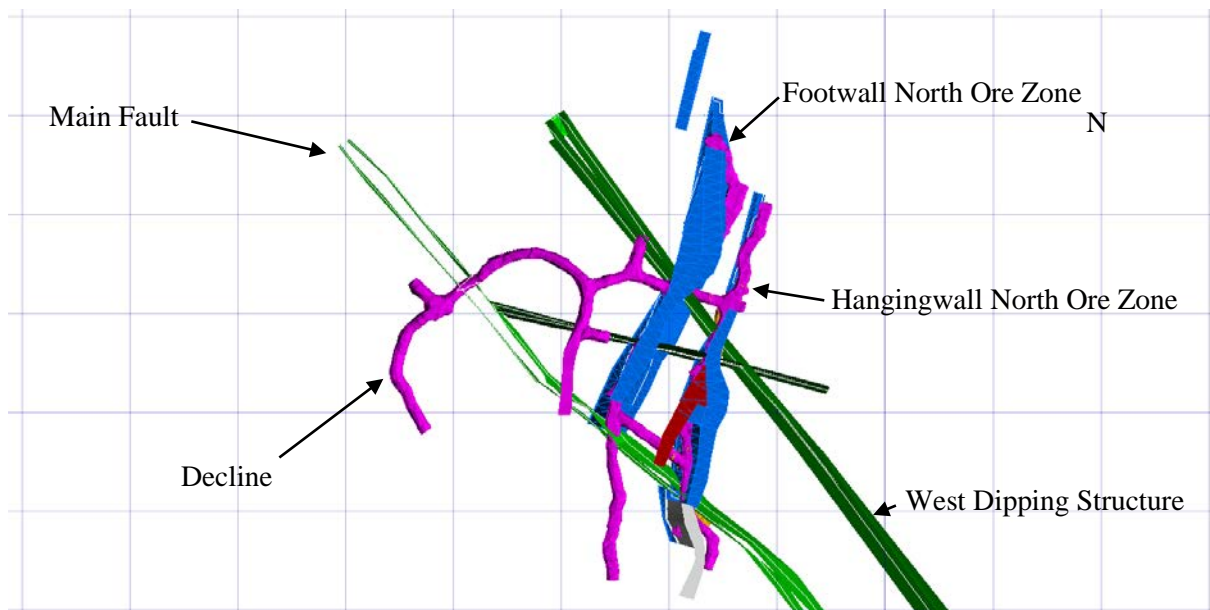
Plan view of Favona underground workings on 980 level showing the interaction of major structures with the Footwall and Hangingwall North Ore Zones; grid spacing is 50 m
